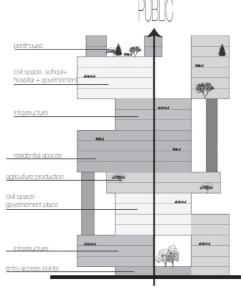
& 9b Jeemin Sohn, site plan and conceptual section of mega-structure and underground connections, The Pyongyang Projects, 2050.
